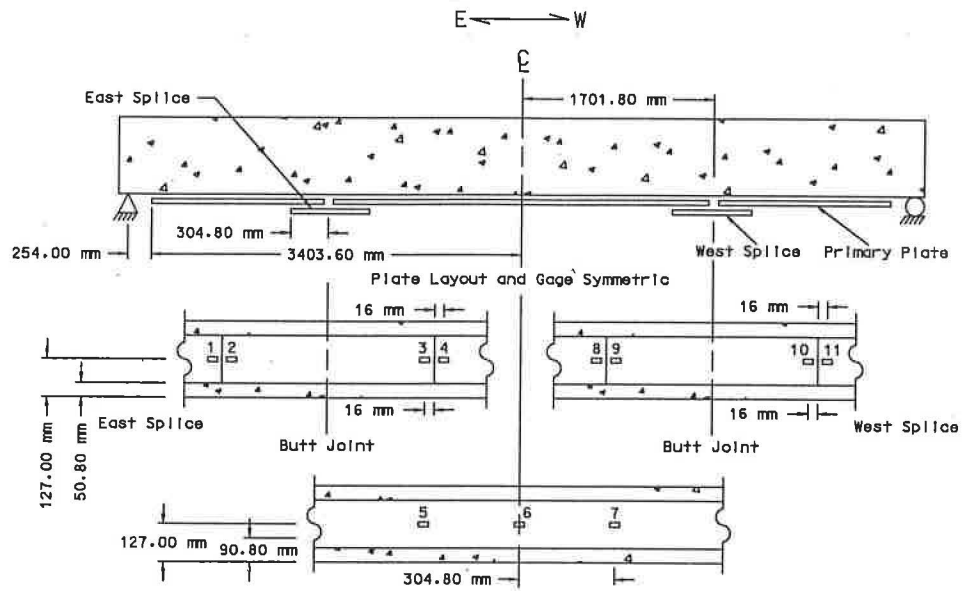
CFRP Plate Layout and Gage Locations, Beam 7 (ULT)
